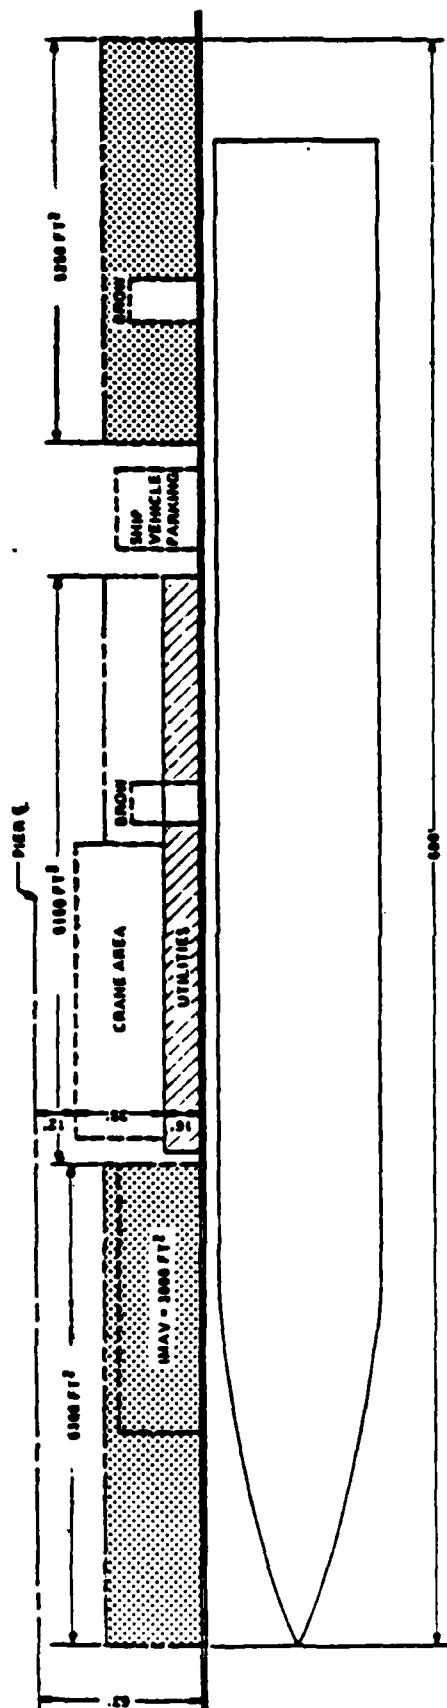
Space Requirements for PRAV - Single-Deck Pier.
